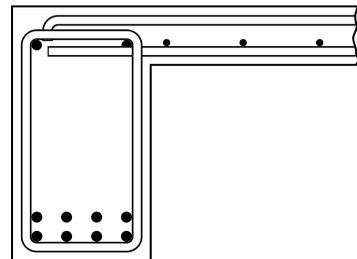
An example of steel-reinforced concrete beam and slab details.
